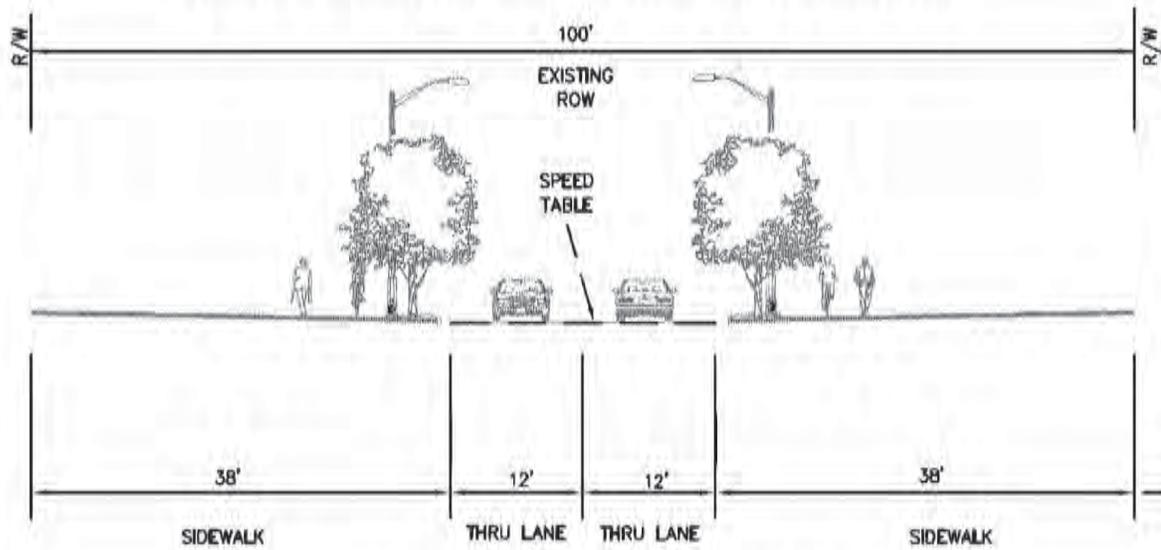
Proposed Cross Section, 3rd Avenue Without Diagonal Parking
